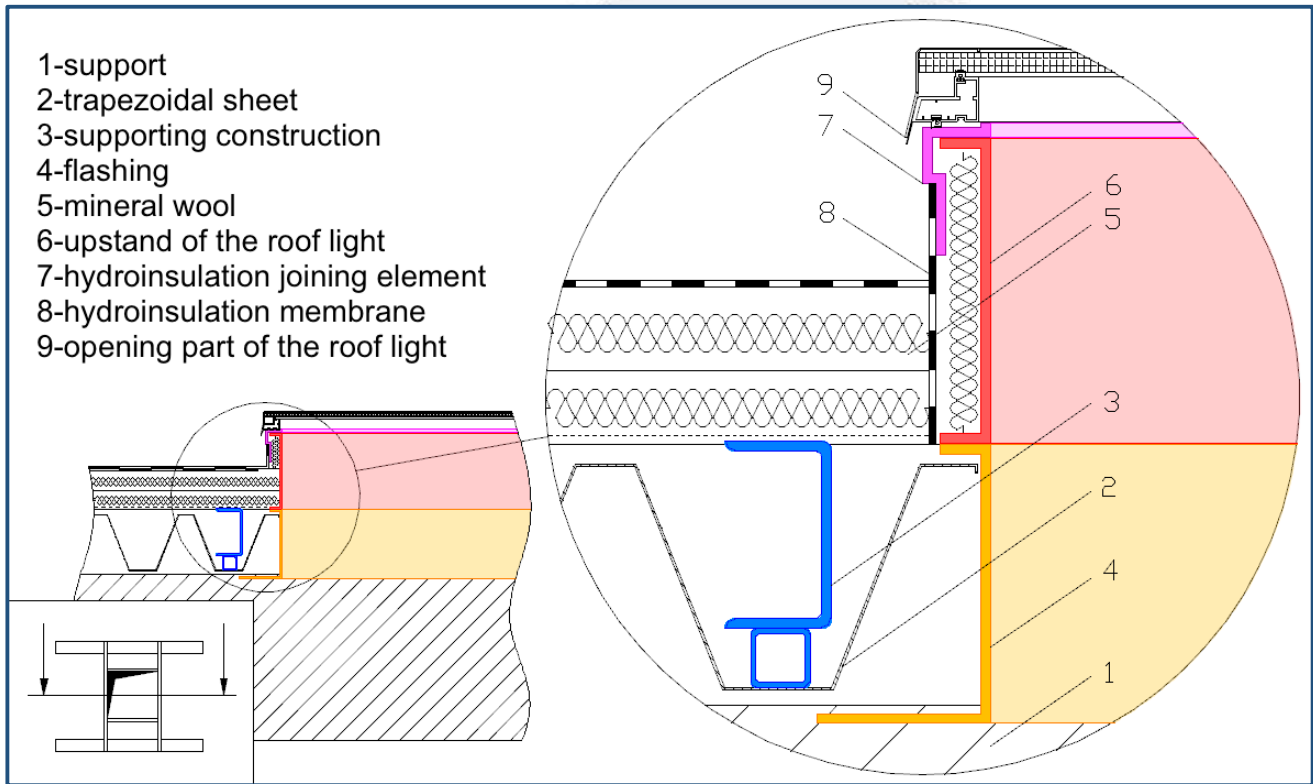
Installation scheme no.3- multilayer roof type
